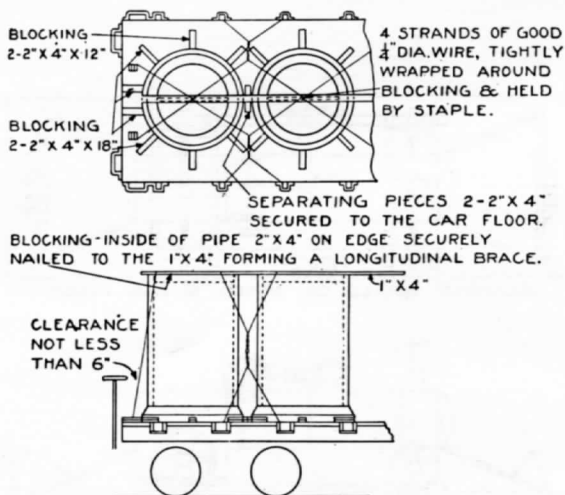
MANNER OF LOADING CONCRETE CULVERT PIPES ON FLAT CARS.
